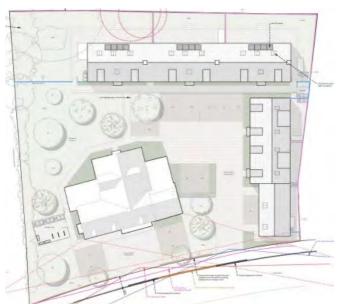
Approved proposed Site Plan for the application at Hope and Anchor, Welwyn Green.
